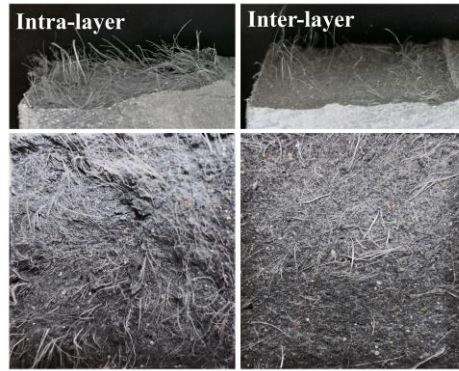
Fracture surfaces of intra- and inter-layer samples.
